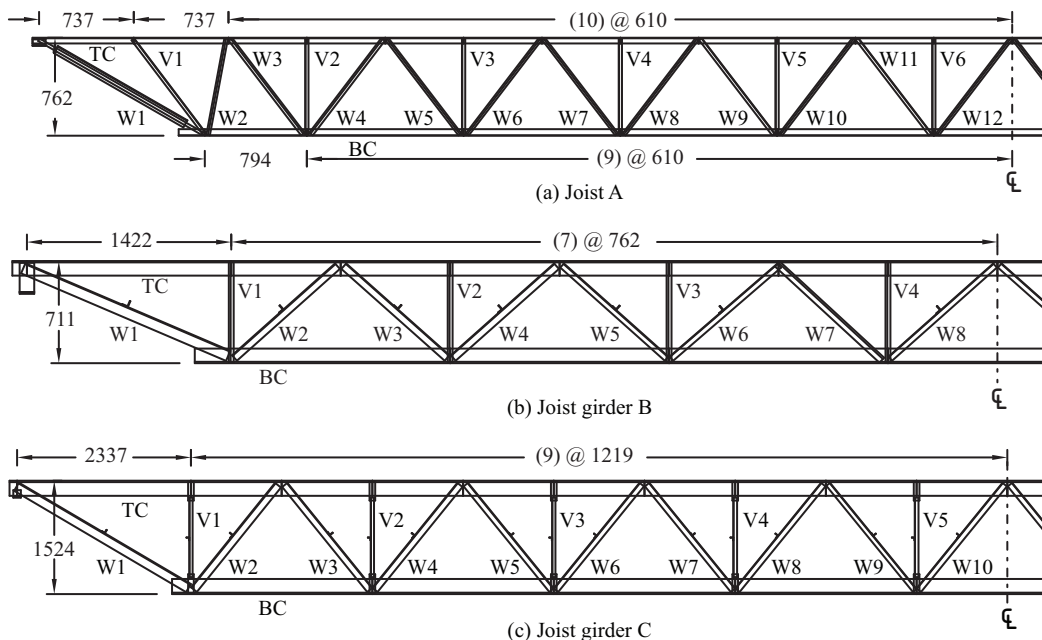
Elevation views of full joist models (Adapted from manufacturer's design package)
